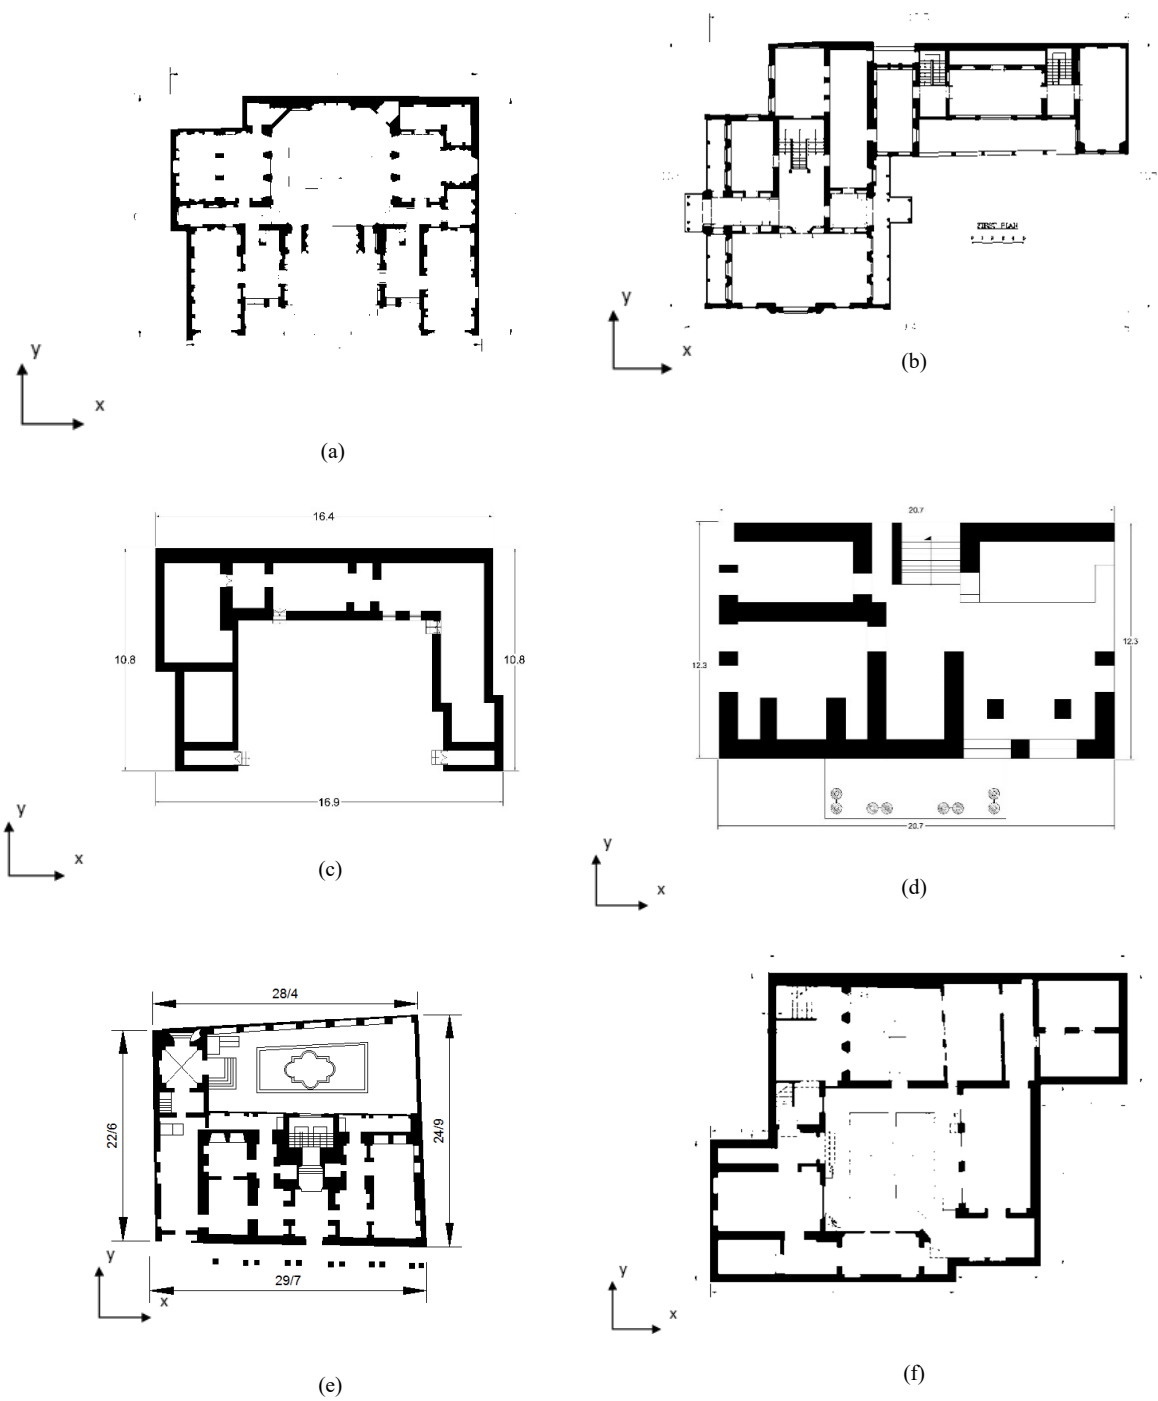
Plans of the case studies. (a) Behnam House, (b) Ganjehizade House, (c) Nafisi House, (d) Kalantar House, (e) Sharbat Oghli House, (f) Ali Monsieur House.
